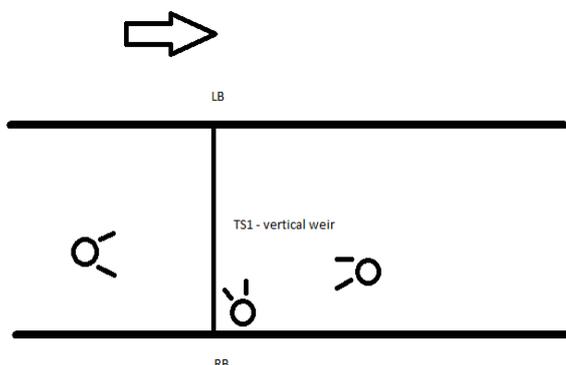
Site plan for Twickenham Barrier 4
